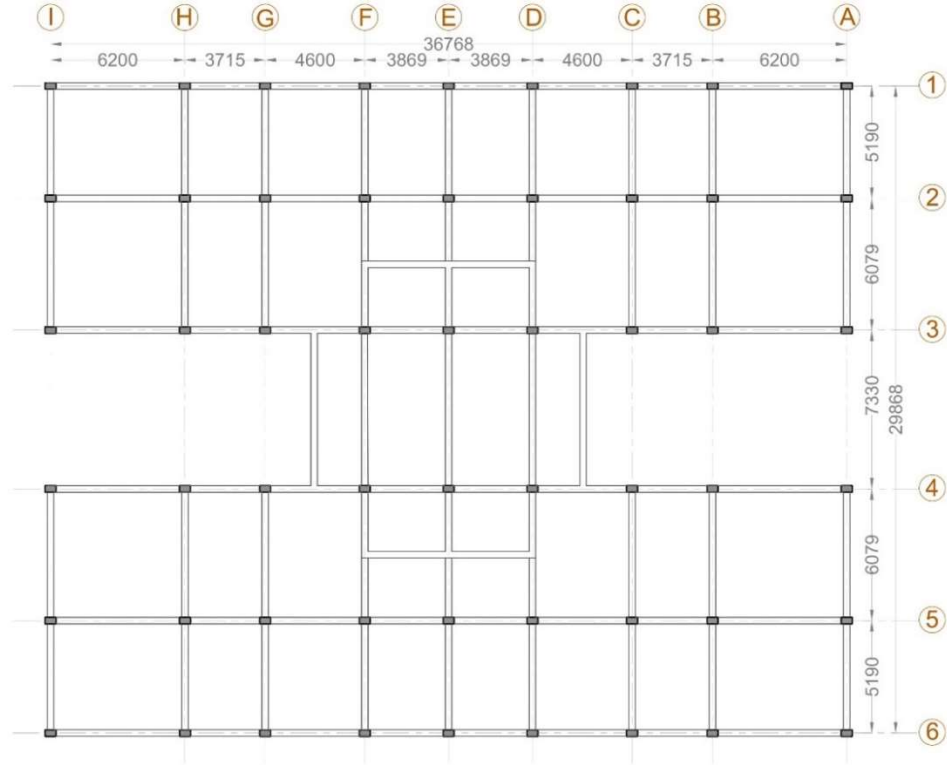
Typical Column-Beam Plan (Case 1 & 2)
